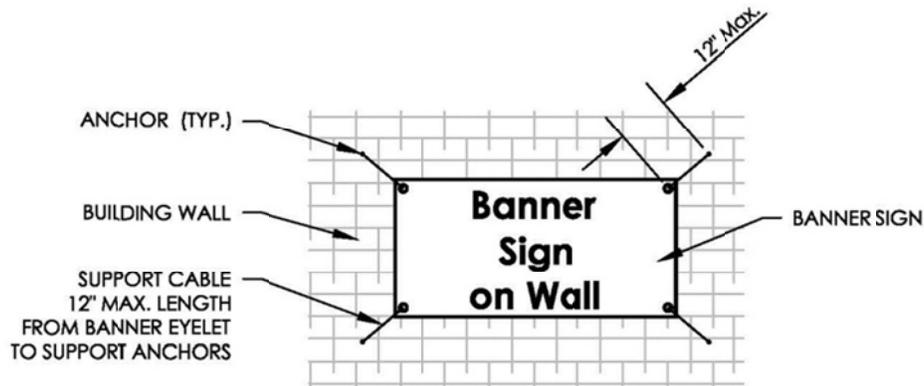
G (5.a) - Wall Mounted Banner Sign
